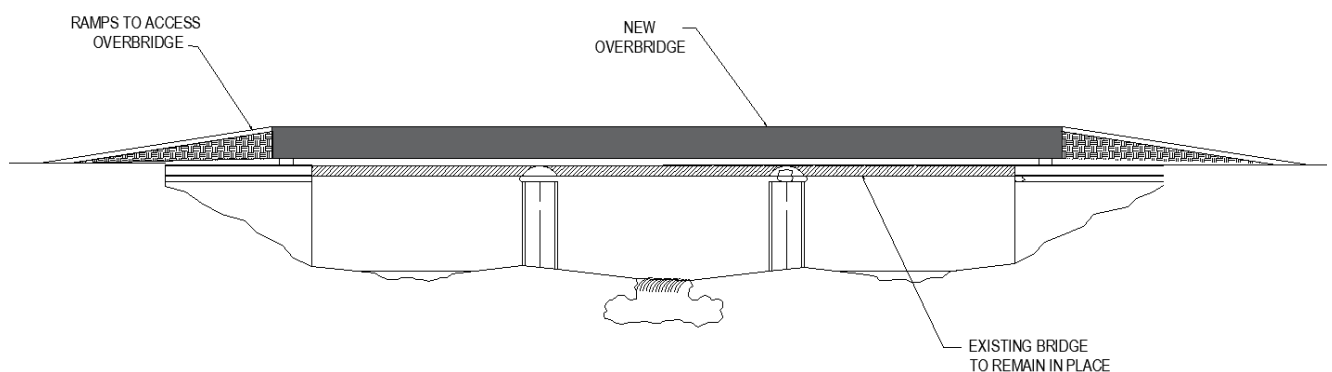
Option 3b Steel Overbridge with Retention of Existing Structure
